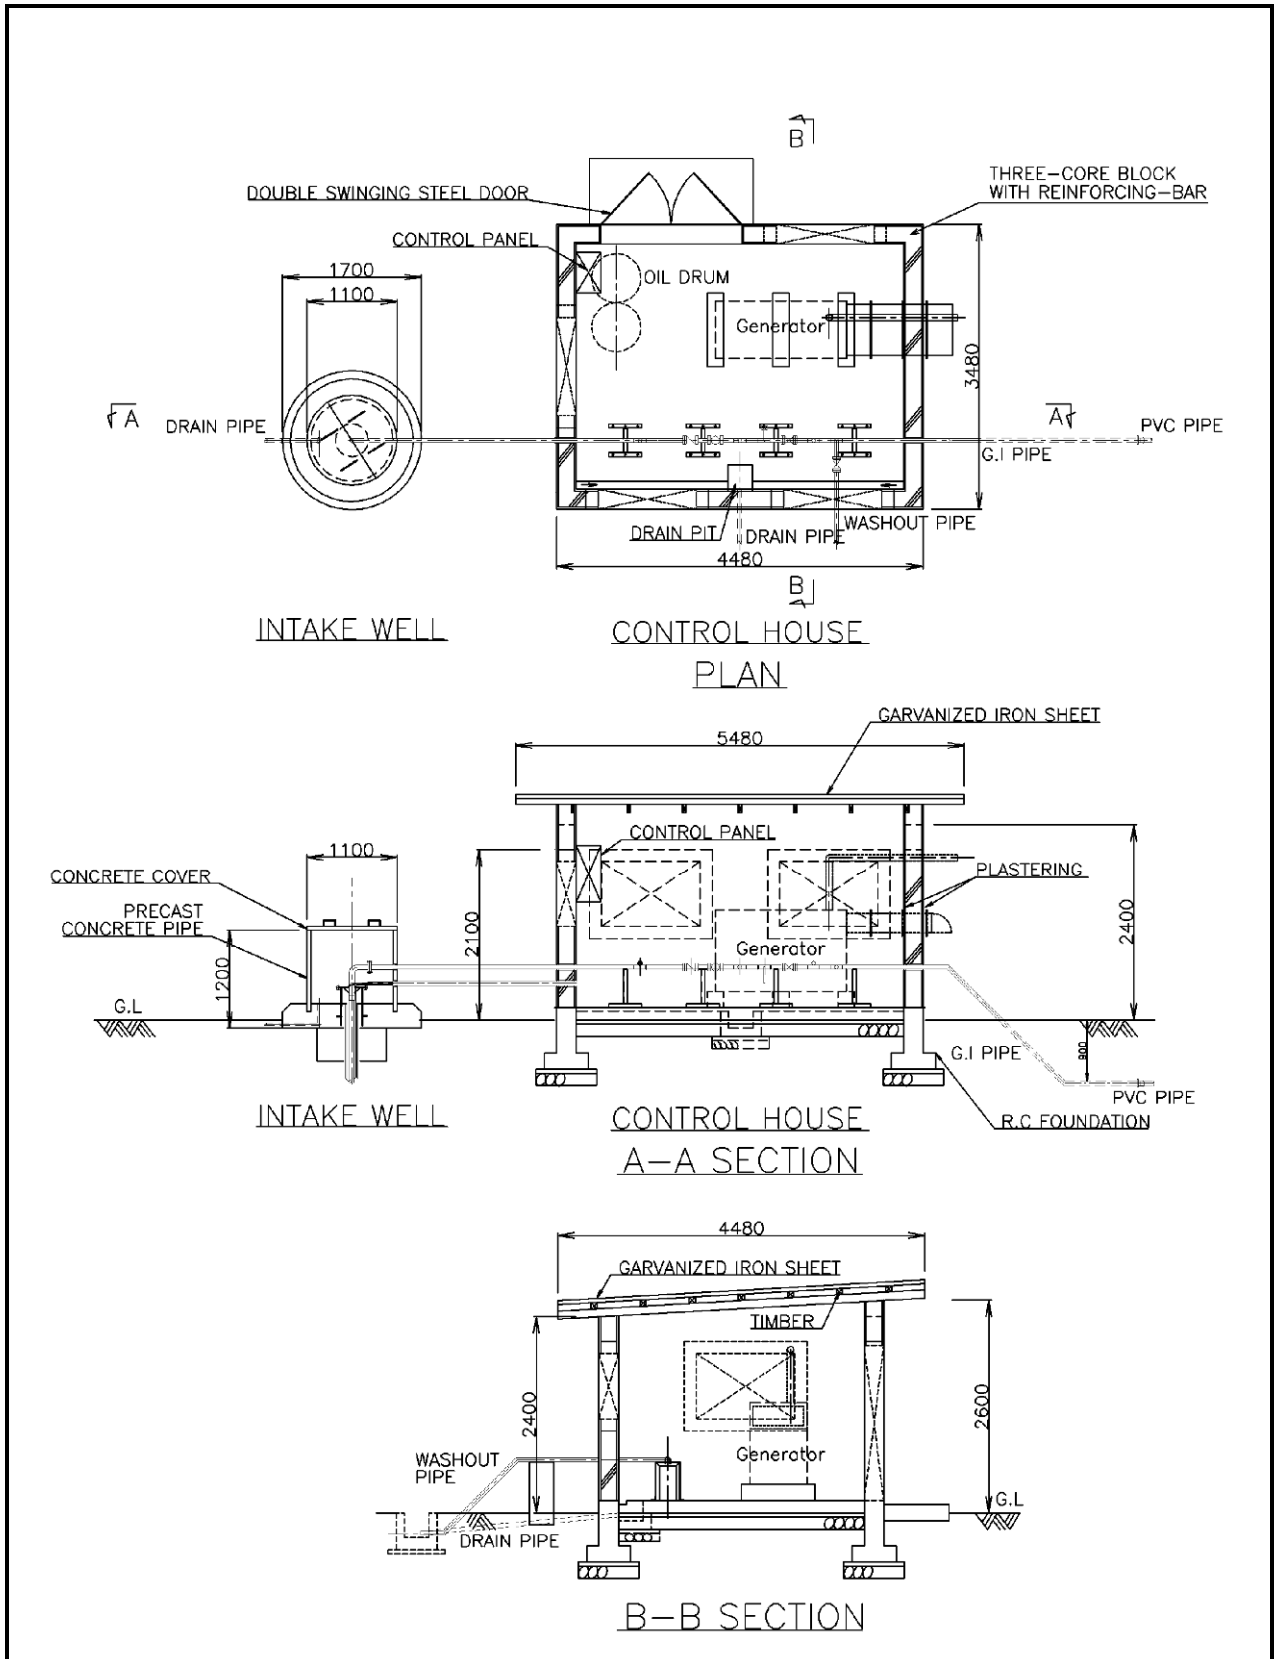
STANDARD DESIGN OF CONTROL HOUSE
